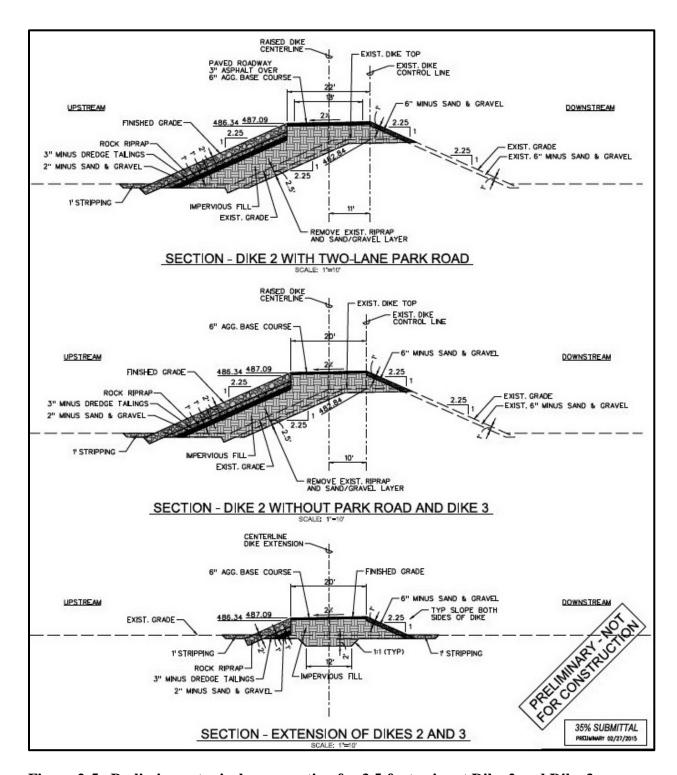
Preliminary typical cross section for 3.5-foot raise at Dike 2 and Dike 3.
